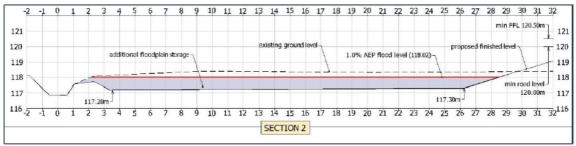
Extract from SSFRA fig.5.2 Plan and Typical Section for Compensatory Basin
